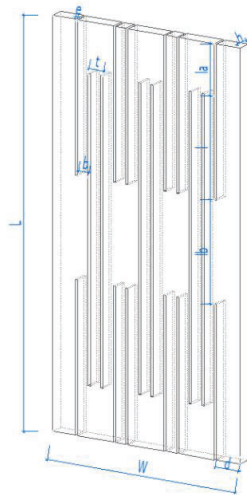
Axonometric view of slotted CLT panel and dimension parameters
